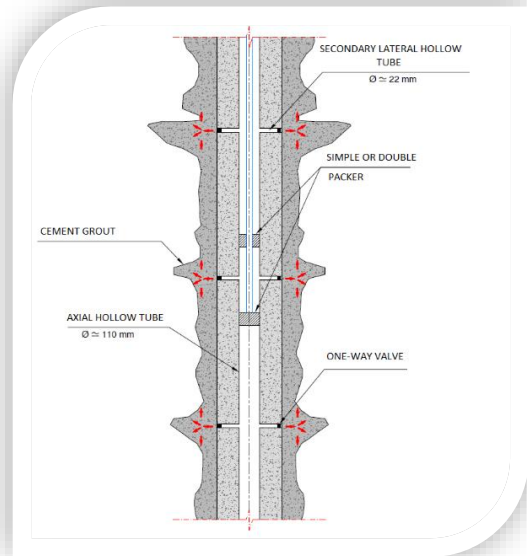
Longitudinal section of the shaft grouted driven concrete pile.
